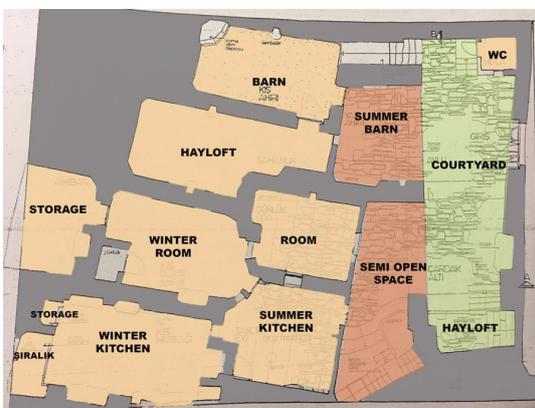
Plan layout of the ground floor of a rock carved house (Erençin, 1976)
